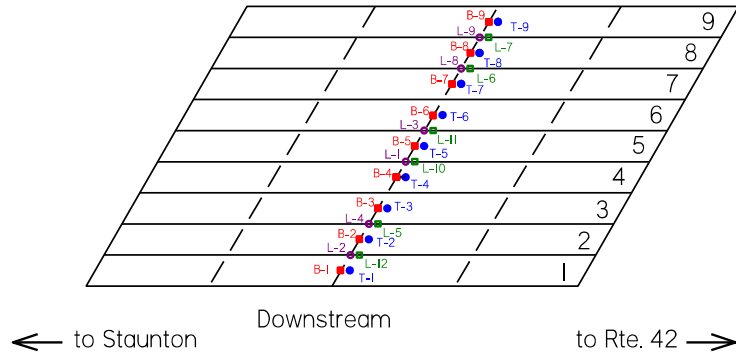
Instrumentation plan for post-repair test (T – deflectometer, B – strain gage, and L – LVDT)
